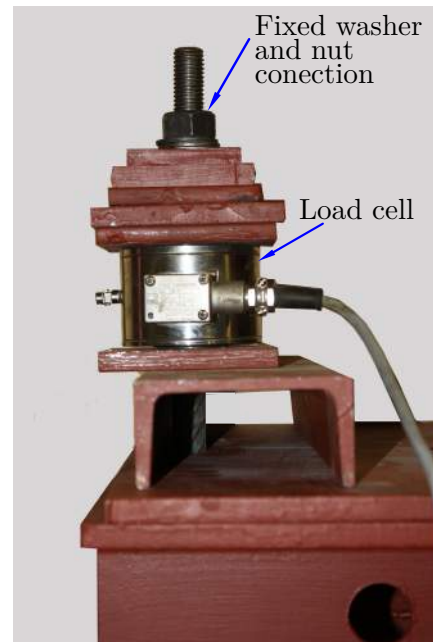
Close-up view of the external load cell assembly with the test rebar passing through the load cell, providing an accurate internal bar force reading.
